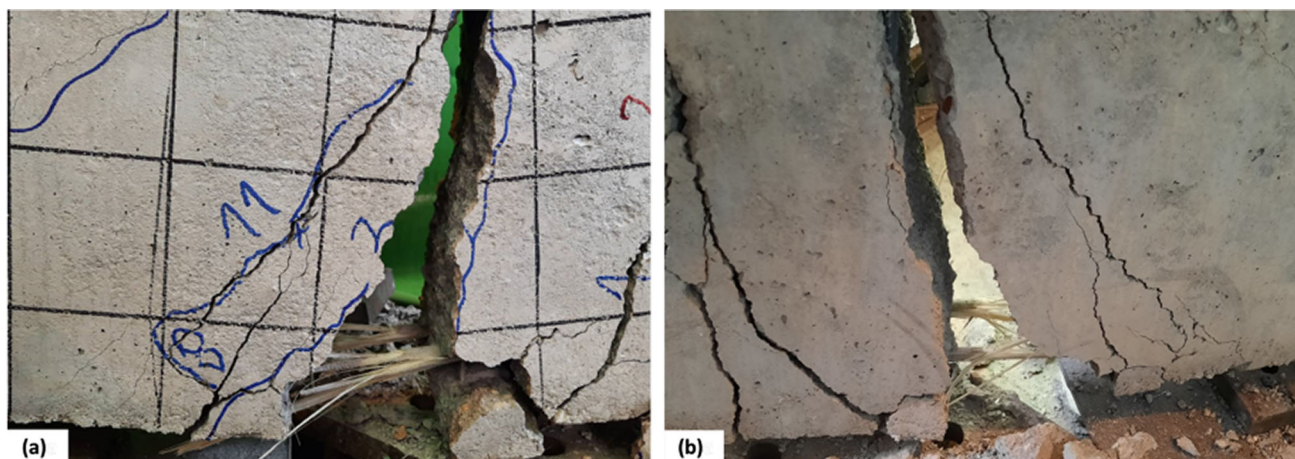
Failure of GFRP rebar: a front view; b back view
